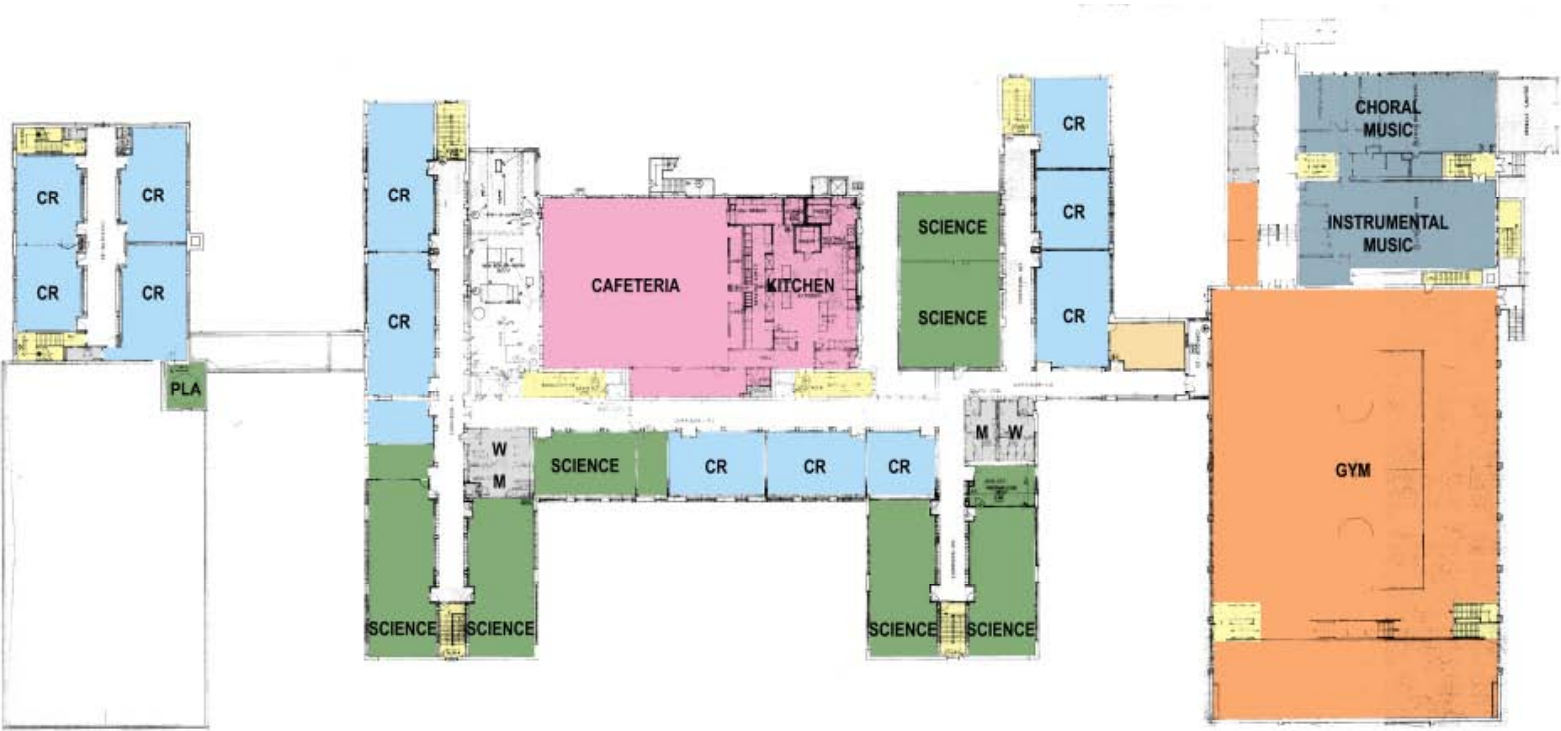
ALLEGANY HIGH SCHOOL SECOND FLOOR PLAN
